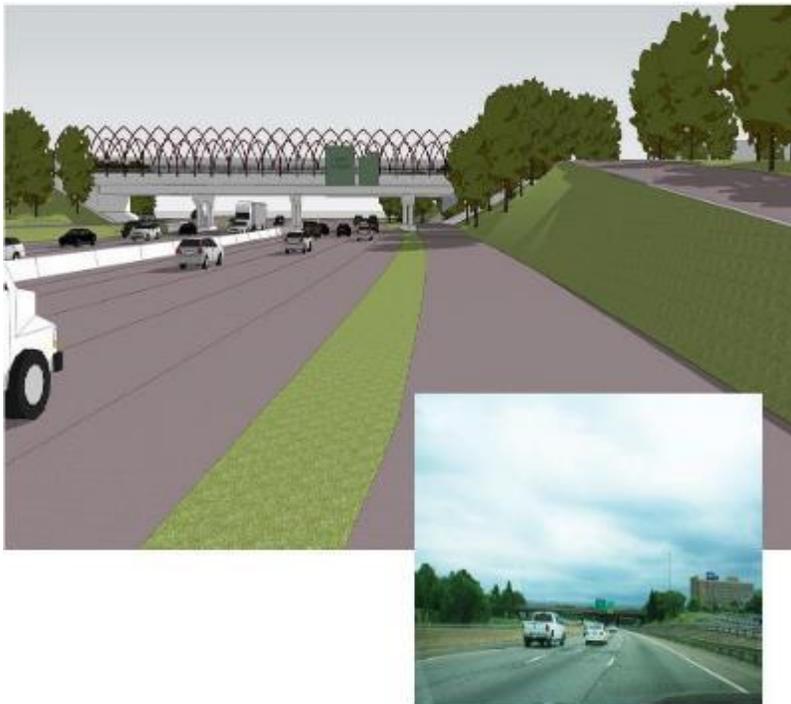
Exit 52 Washington Street coming into the City (artist rendering and photographs)
